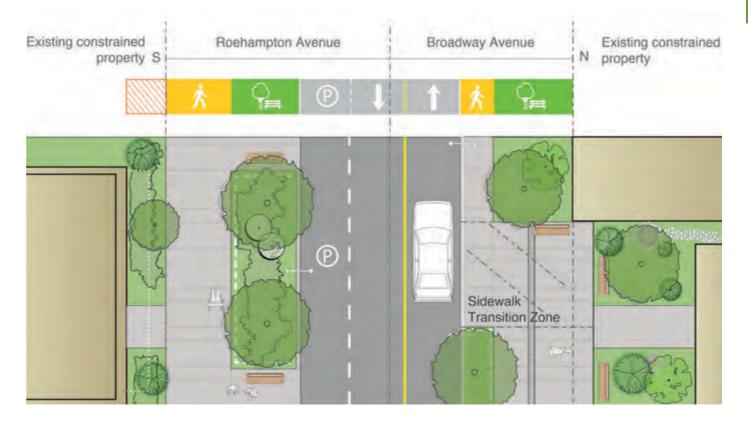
Plan of existing constrained and sidewalk transition - Recommended Final Condition
